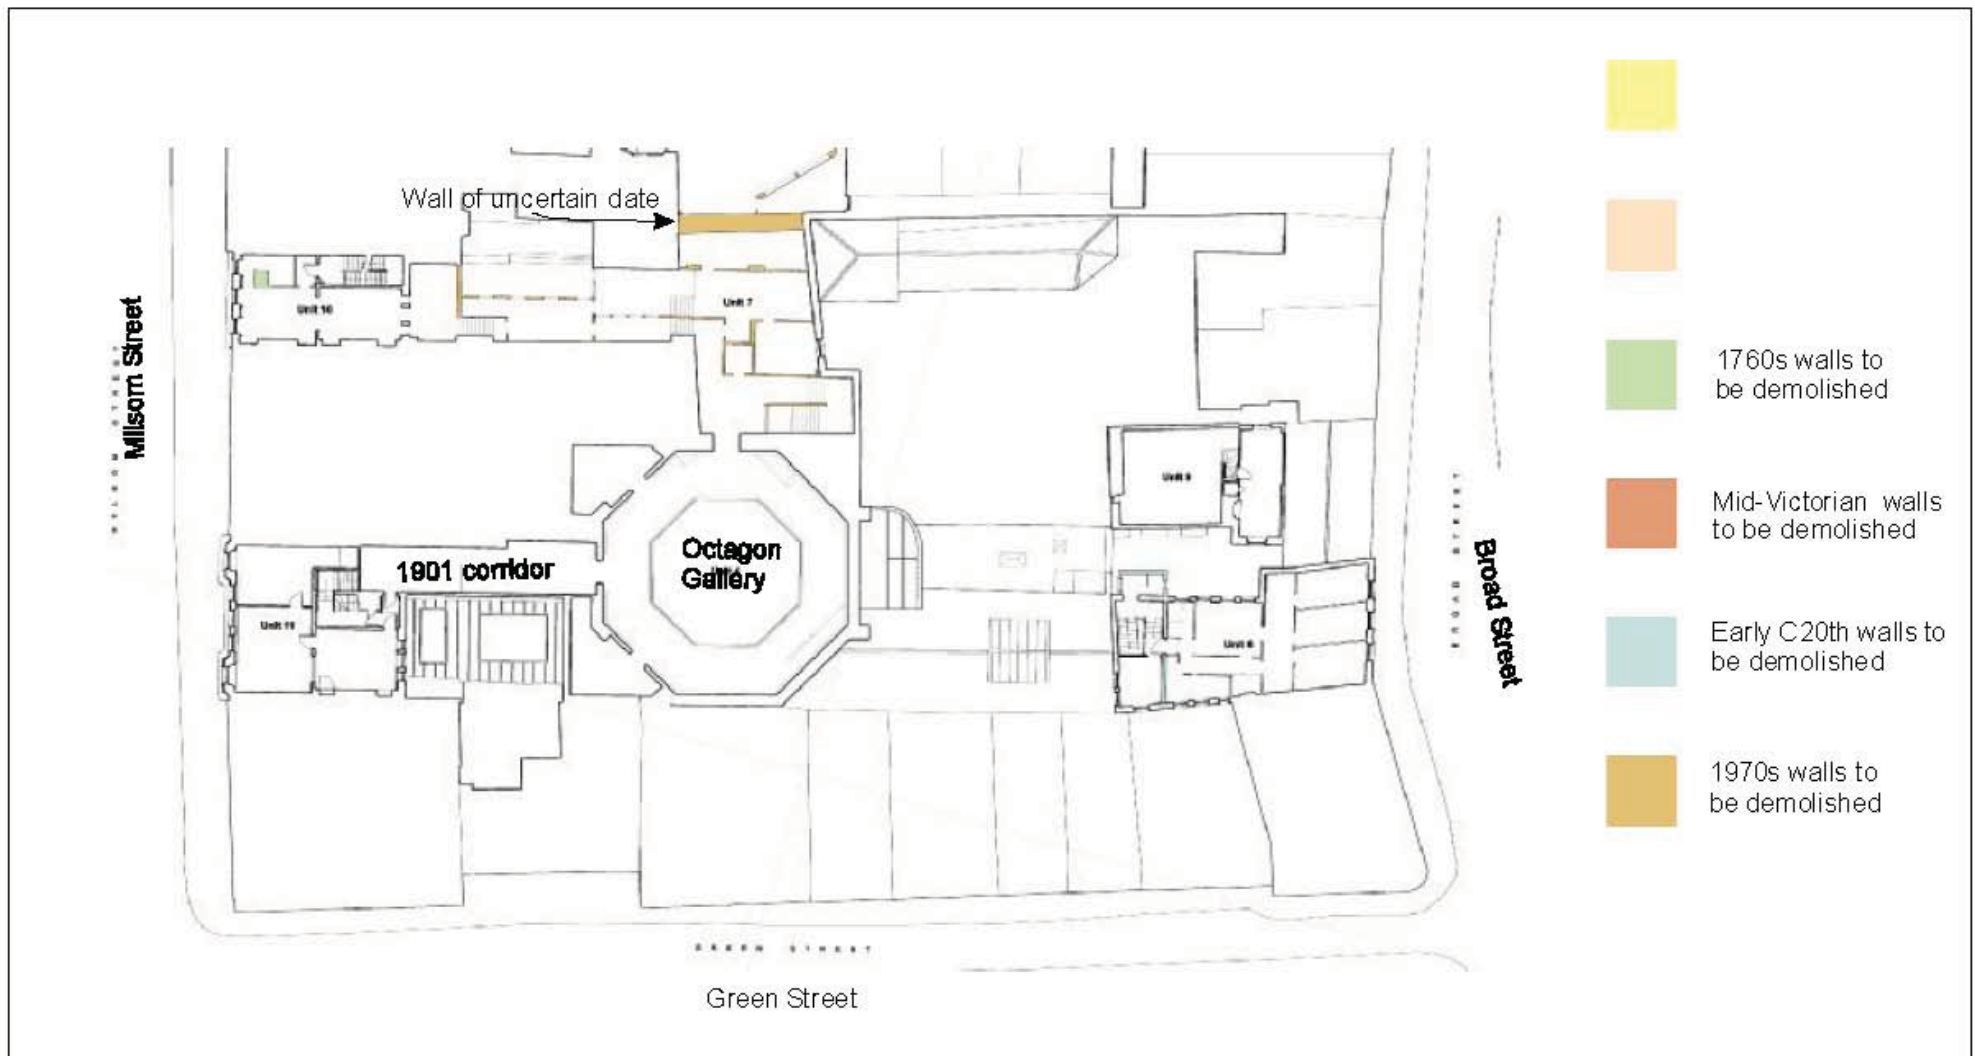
Plan of first floor of Milsom Street side and second floor of Broad Street side of the proposal area and proposed demolitions with date key. Based on a drawing supplied by DLG Architects
